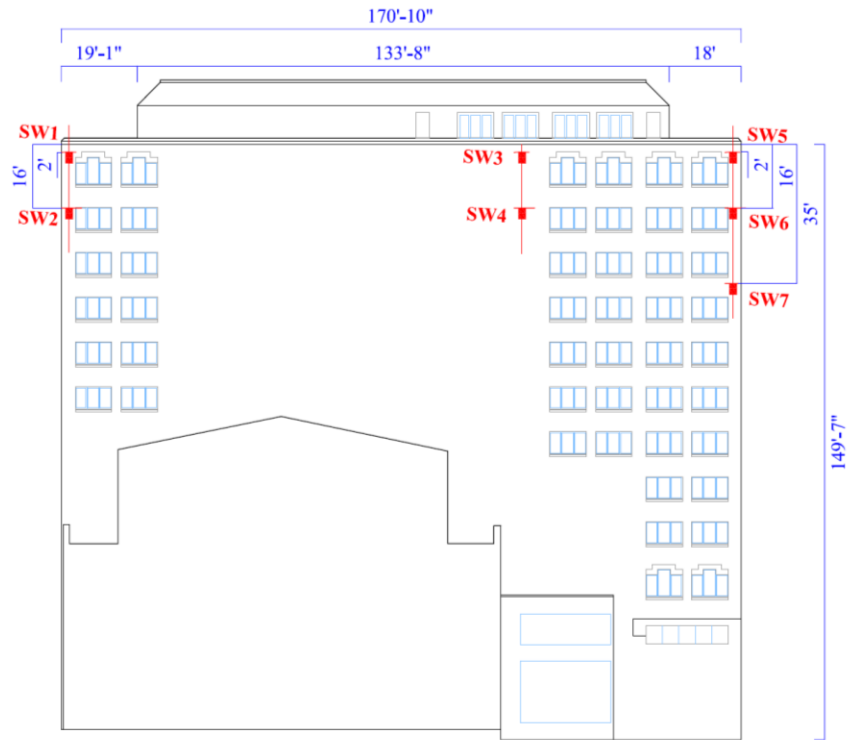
South-west elevation of FB Building with driving rain gauge locations
